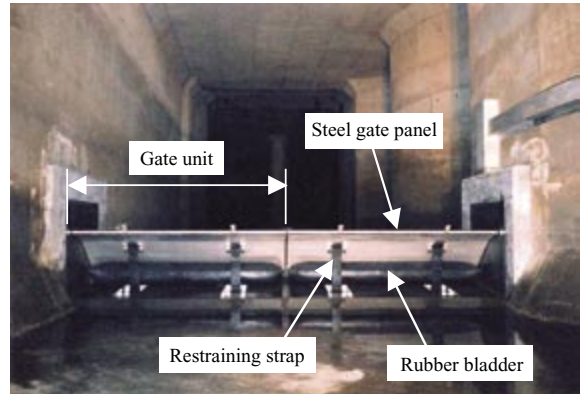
Installation example W4.600 m × H0.500 m (Kanazawa Pump Station, Yokohama City)
